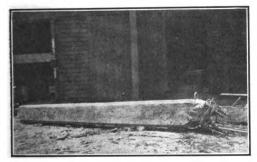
Pile with Head Smashed, Exposing Reinforcement.
